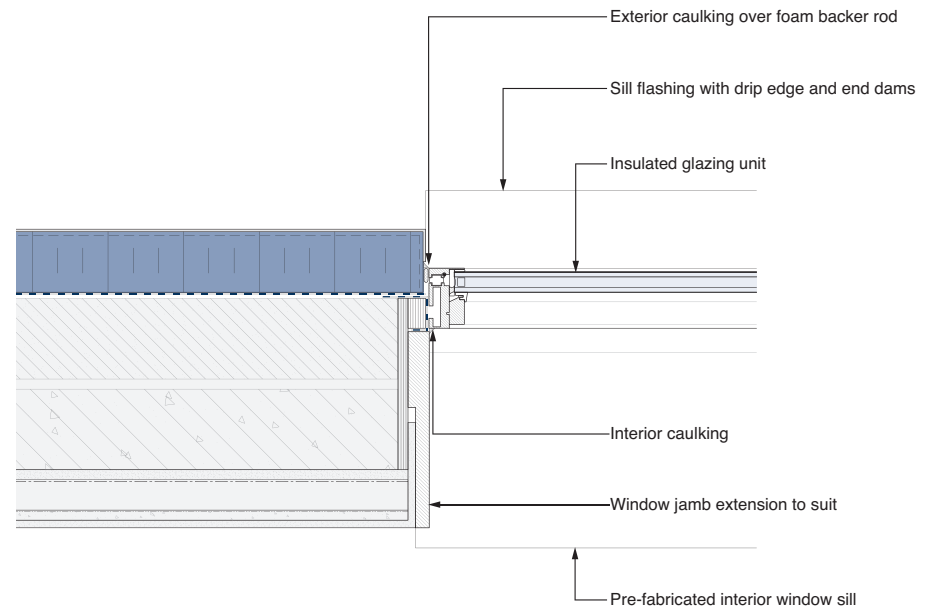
Pre-finished window jamb extensions complement the pre-fabricated window sill to facilitate interior finishing of the retrofit window opening within a single visit, minimizing tenant disruption.
